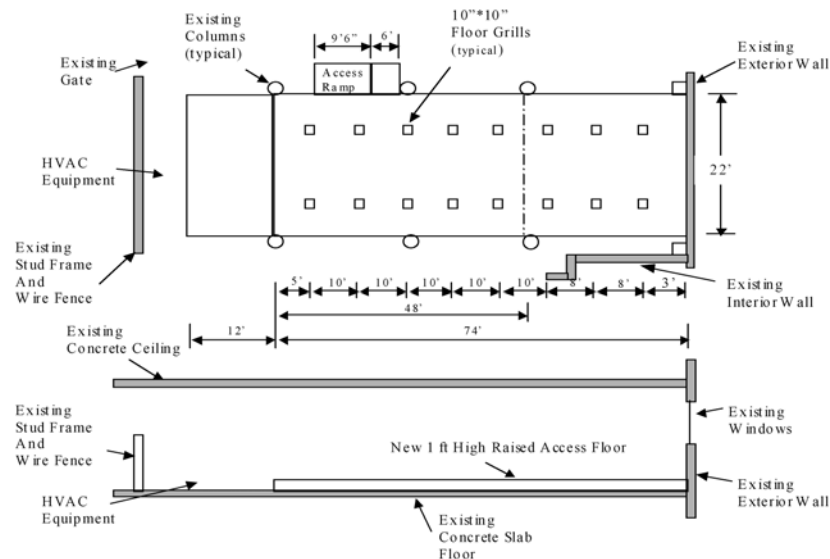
Plan and section views of underfloor air supply plenum test facility.
